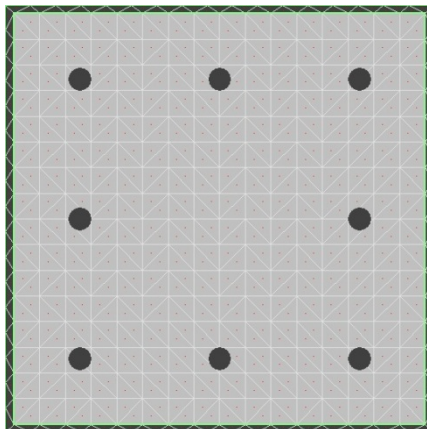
Steel Jacketed Column 5A13 Cross Sectional Detail
